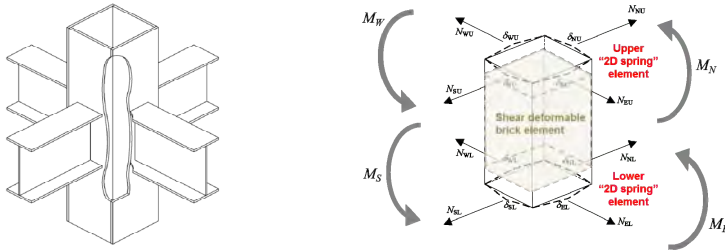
Outline of 2-D spring elements' application to 3-D square hollow section column-to-beam joint
